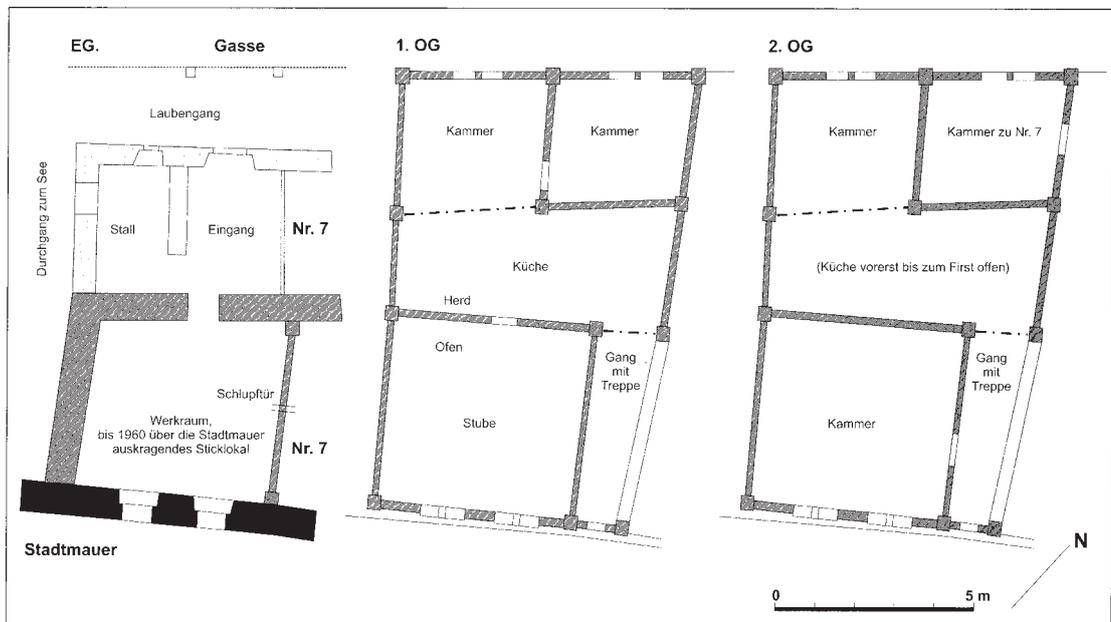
Werdenberg. House No. 8 Floor Plans (*Albertin 2000*, Figure 10).
